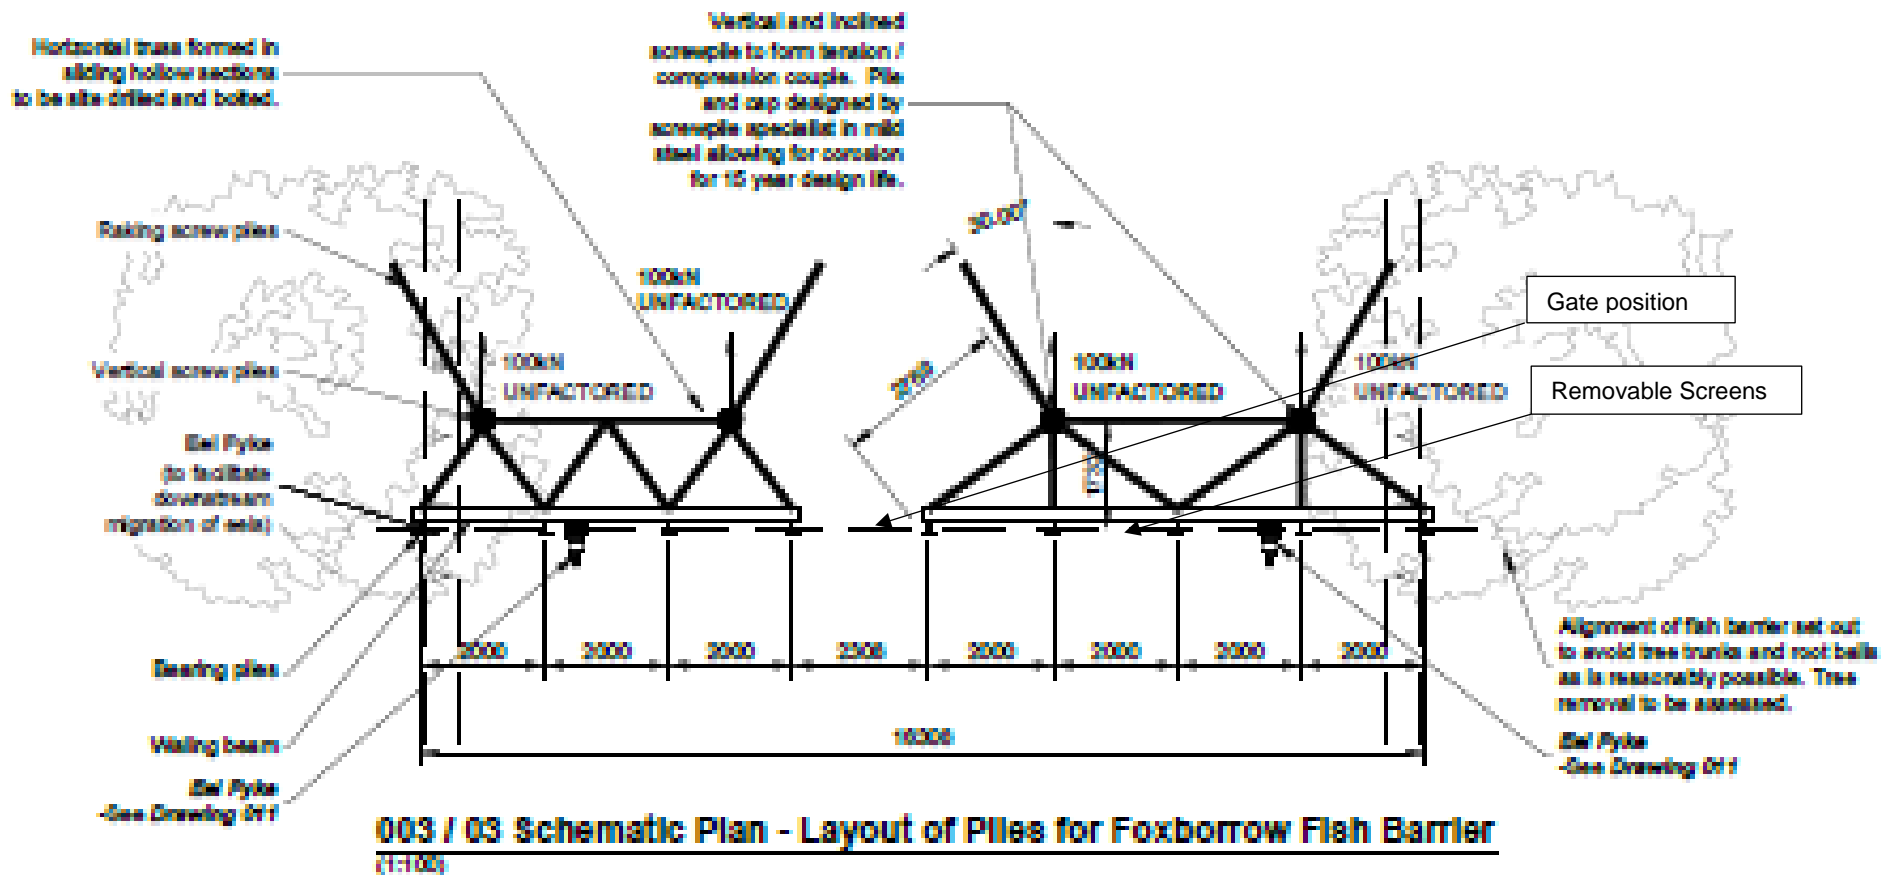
Design of Fish Barrier – Plan Extract From Drawing 003
